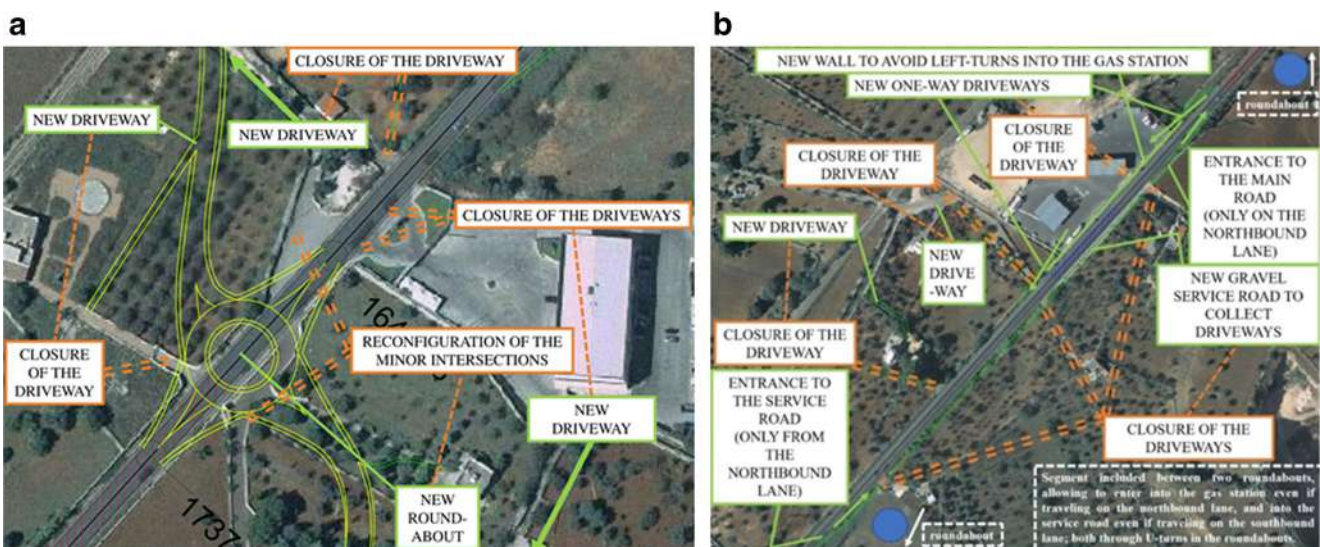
Possible solutions of driveways/minor intersection-related issues. Site PP2: a example of roundabout for enhancing minor intersection geometry, b example of service roads and driveways reconnection through minor roads
